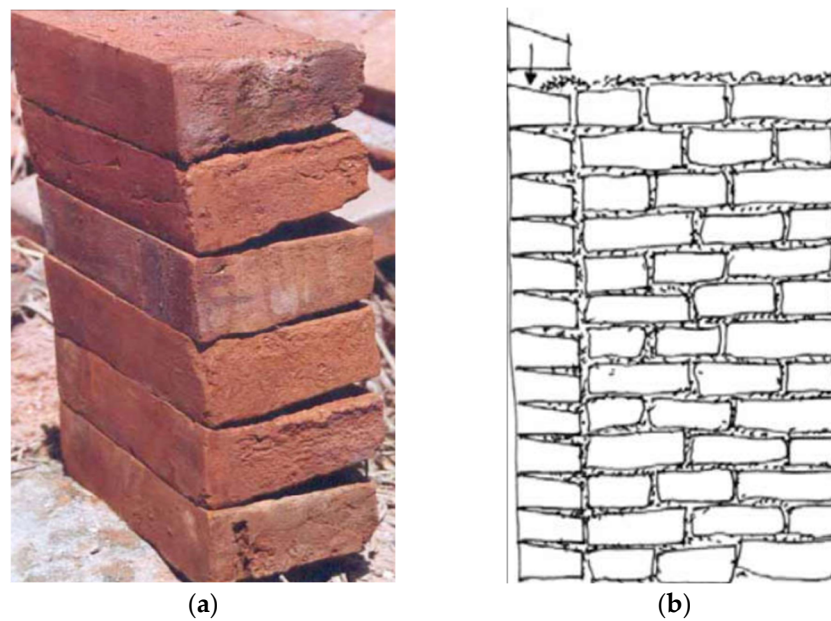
Dachy-Apa bricks: (a) photo of bricks stacked over each other; (b) cross section of ground-level masonry wall showing the Dachy-Apa bricks covering the façade.
